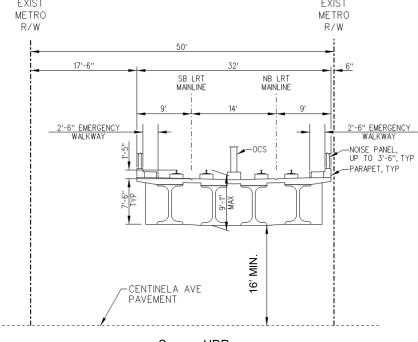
Alternative 1A – Preliminary Bridge Section
